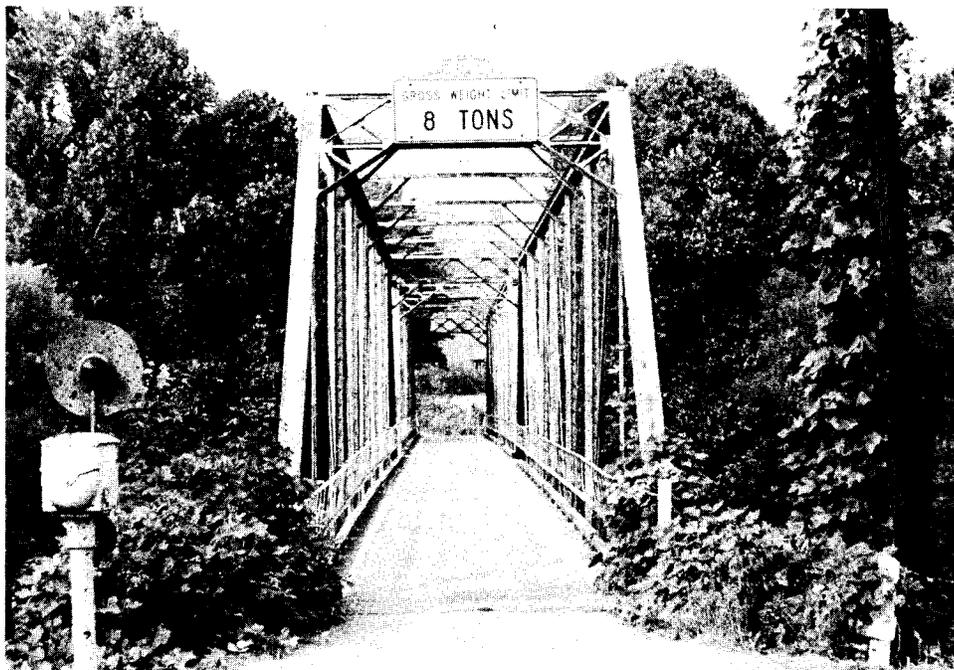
The Chicago Bridge Company built this two-span Pratt through truss in Russell County in 1891.
